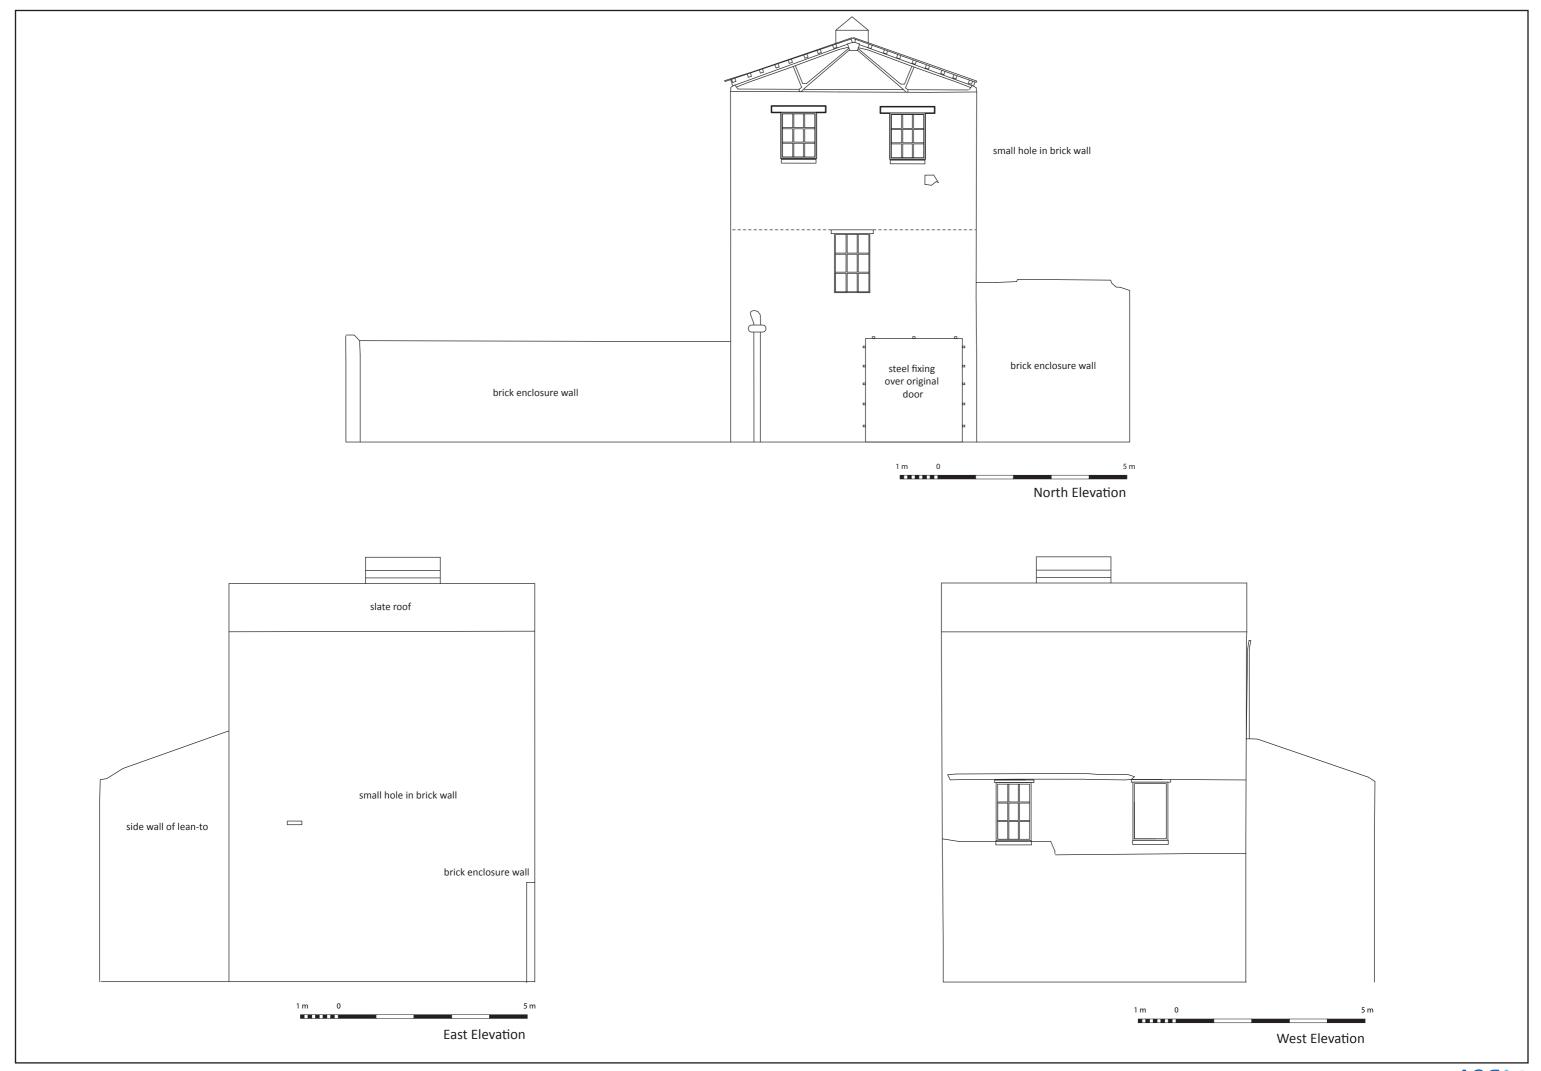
Kinleith Mill building, exterior elevations Archaeology Group
